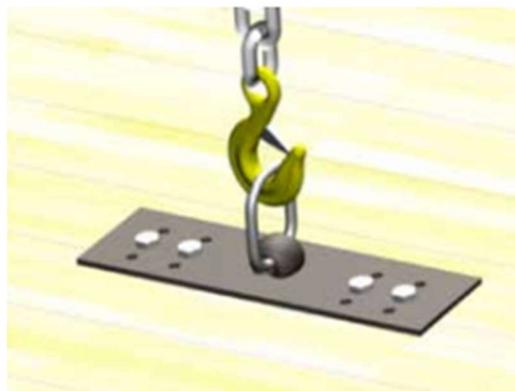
Screwed Plate and Lifting Ring (Karacabevli, 2013)
